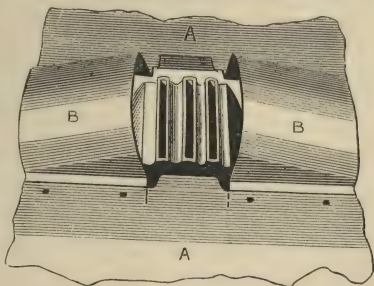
Enlarged View of Burner, Showing How it is Fitted.
